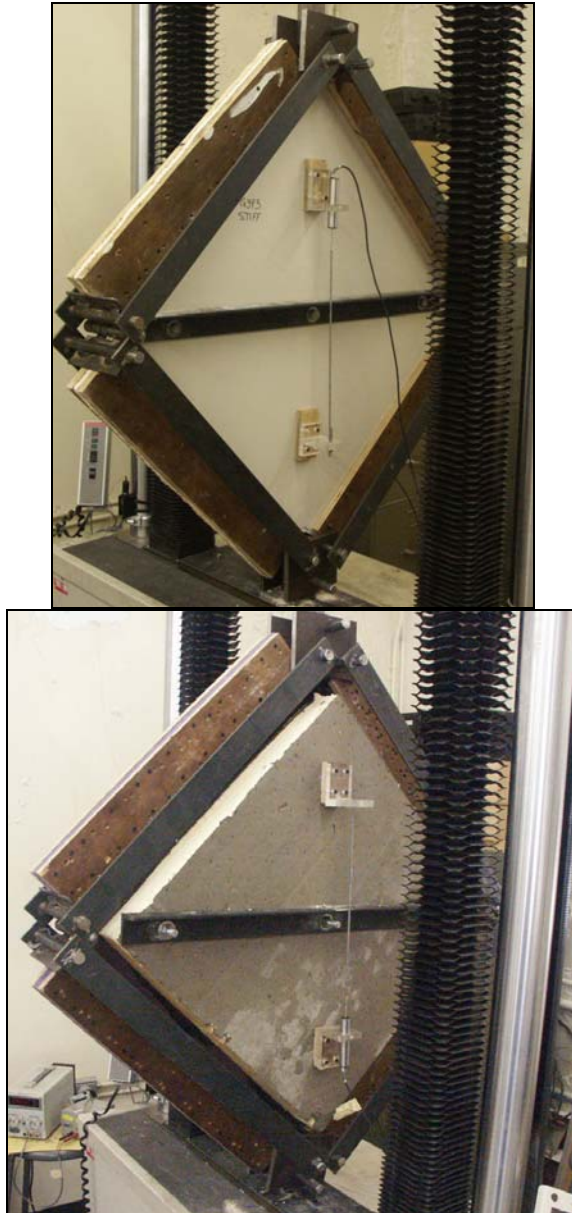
Four-sided shear test setup: a) gypsum board specimen; b) “full component” specimen
